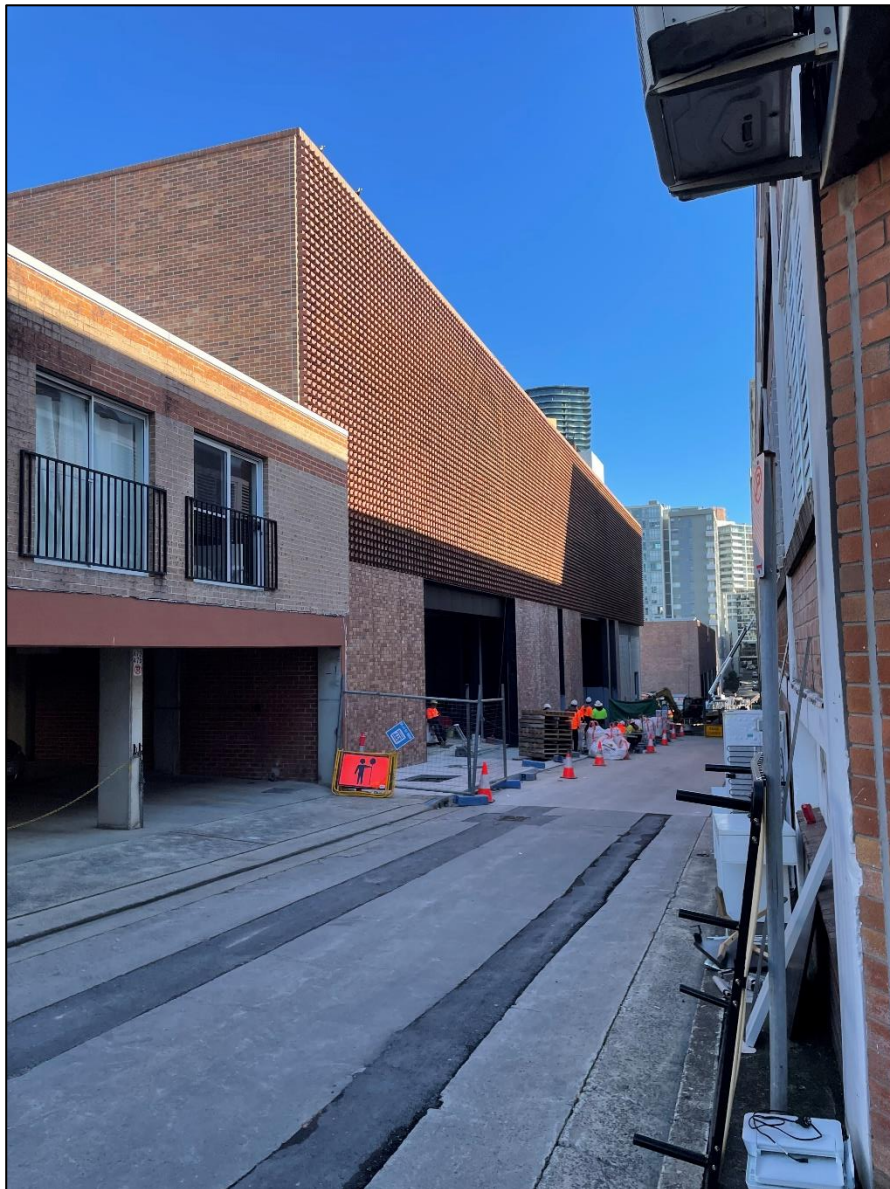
View from Clarke Lane looking North to Site B (July 2024)
